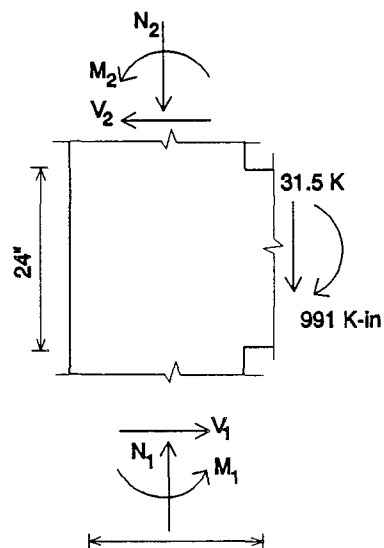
Forces acting on the 2nd floor lintel-column connection of Specimen 1b for the case of load to the left
